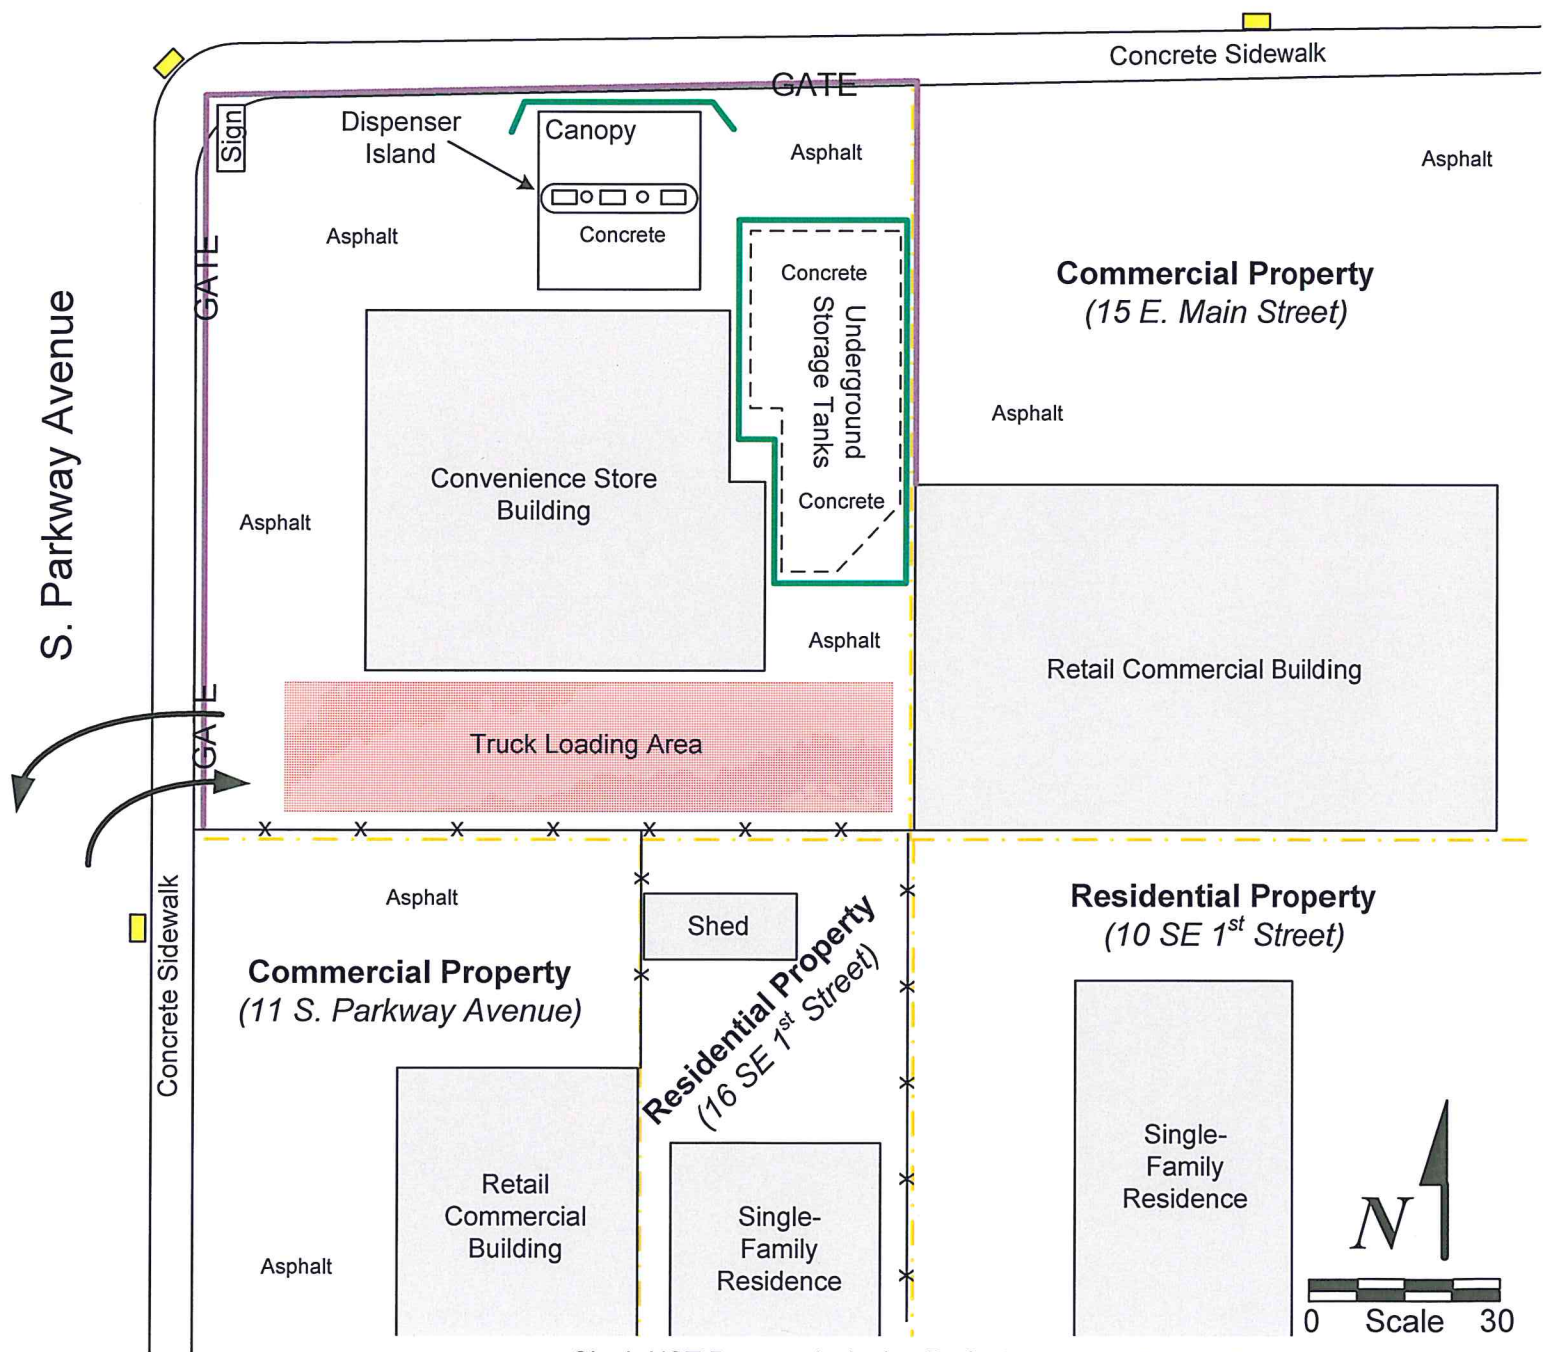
TESC & TRAFFIC CONTROL PLAN
